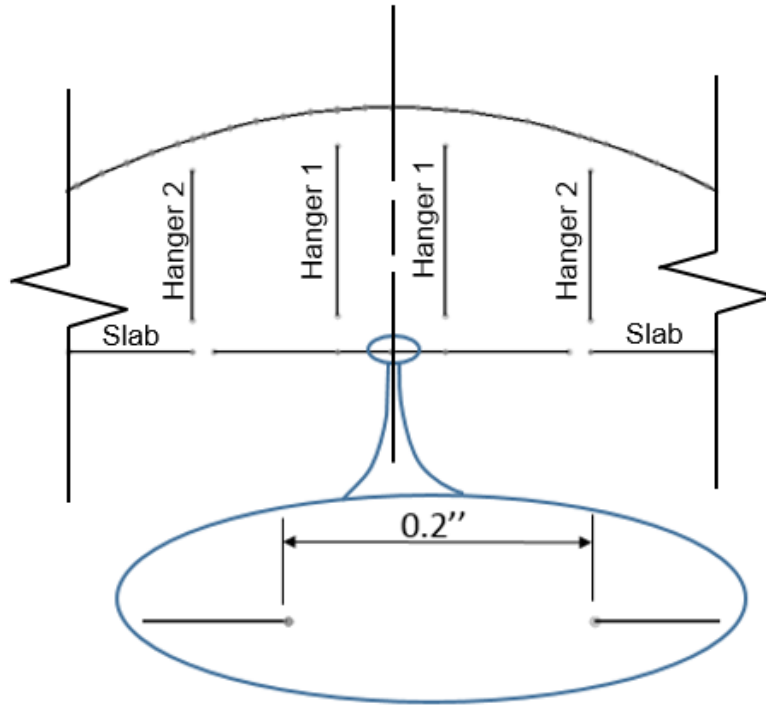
Deck Slab Showing Slabs at Midspan are Not Connected (SAP 2013)
